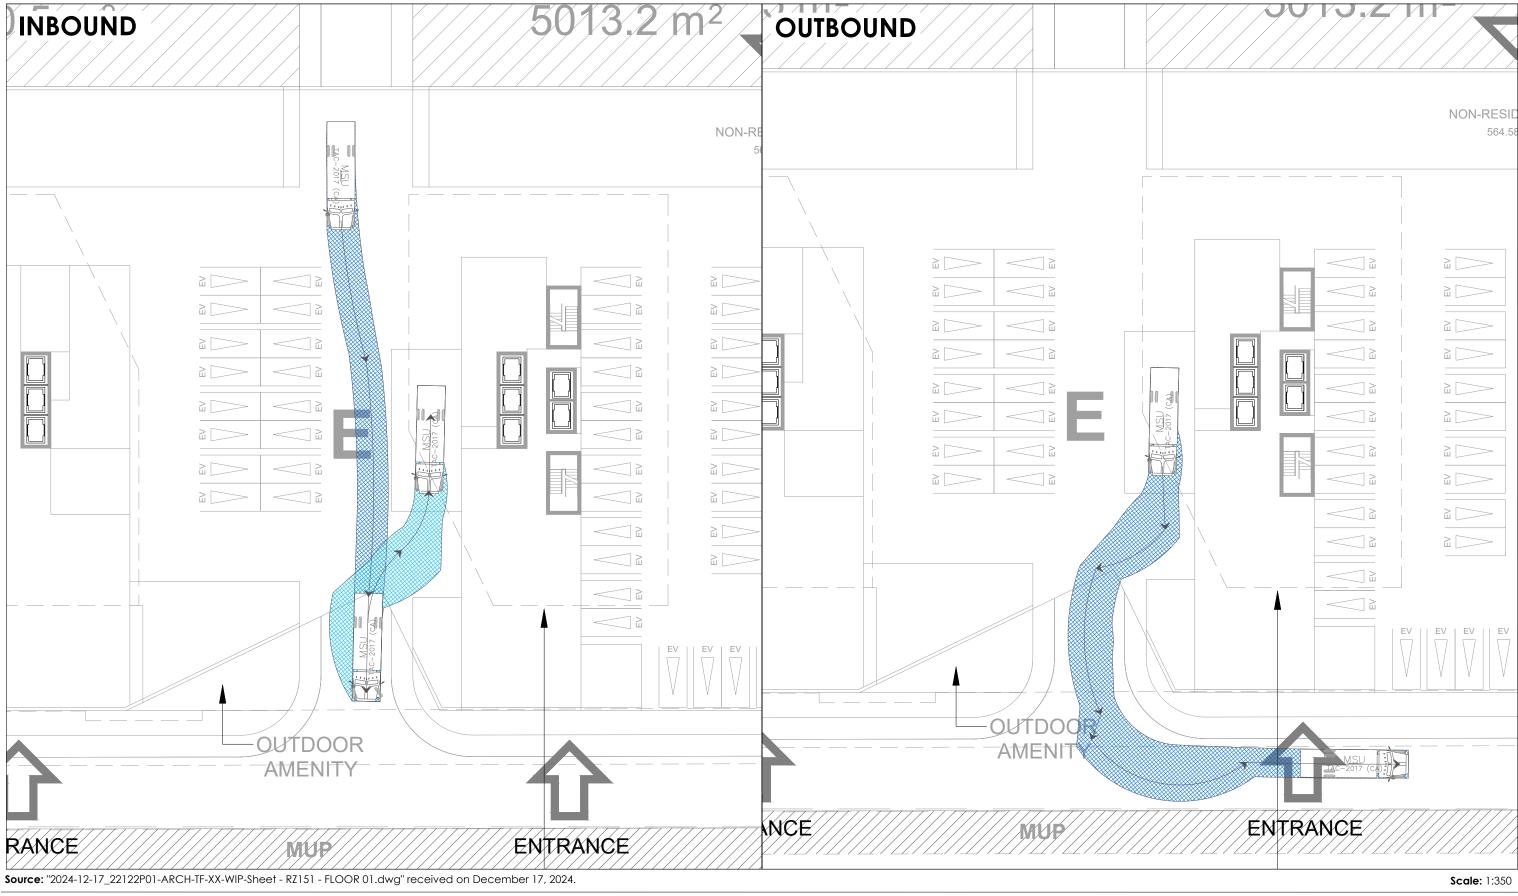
MSU Loading Truck Turning Maneuver - Building D - Loading Space 1 1105-1163 Kingston Road, Pickering
